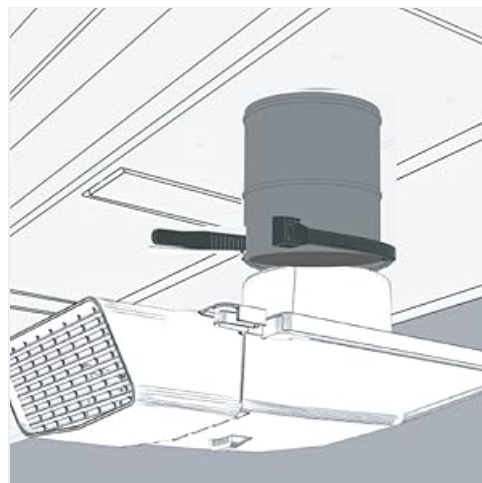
The soffit vent connects to the bathroom fan ducting in the attic.
